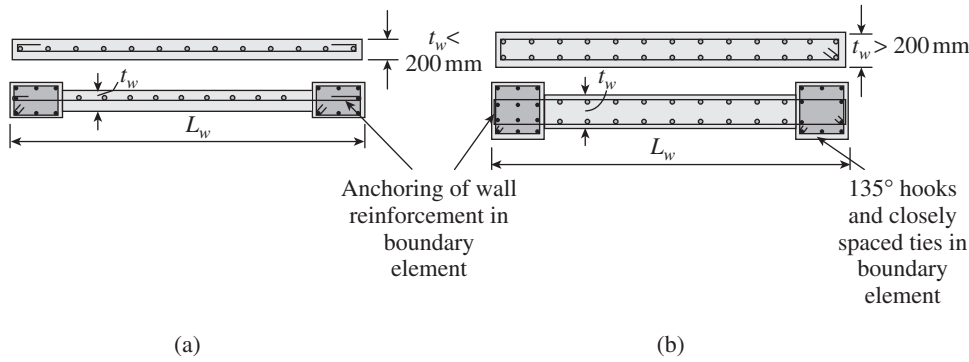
Detailing of walls with and without boundary elements (a) Single curtain of reinforcement (b) Double curtains of reinforcement
